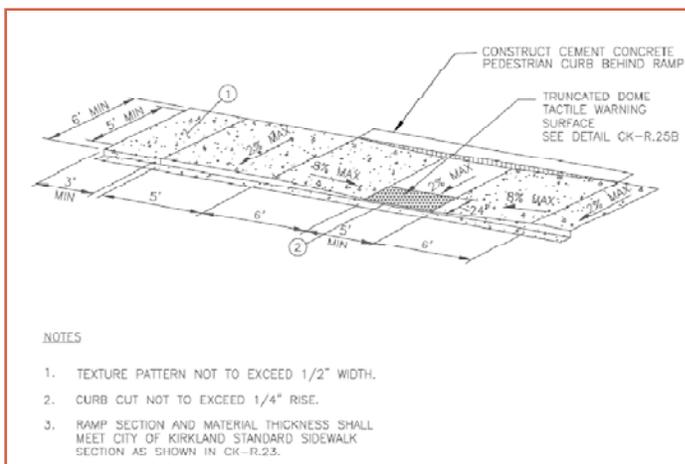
Sample drawing from pre-approved plans showing how to construct a mid block sidewalk ramp
